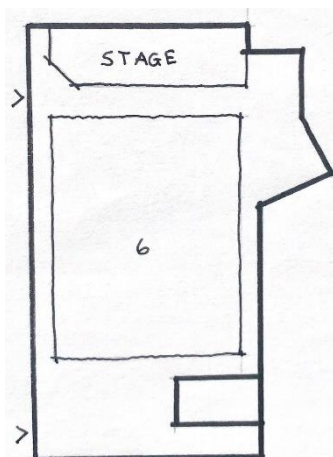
Plan form of the Burgerspark Church (Author, 2023).
